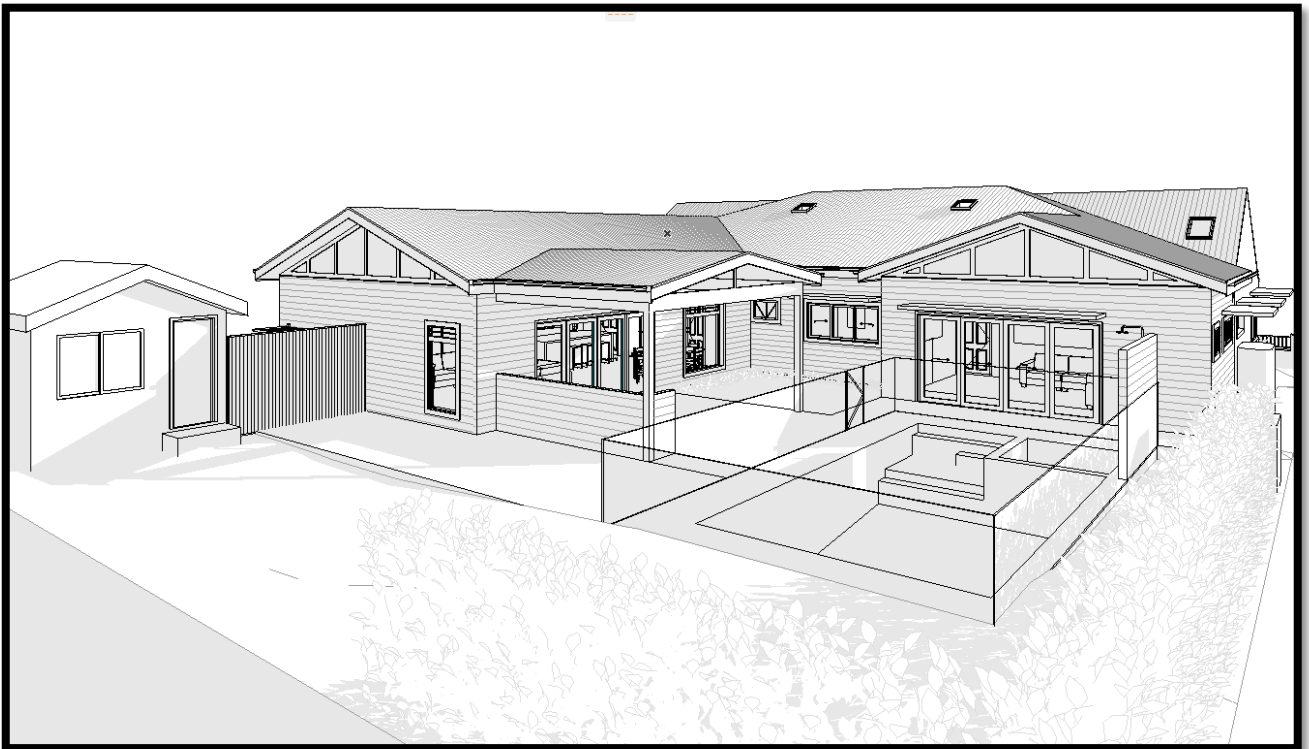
Proposed works at No. 27 Grace Avenue. (*Action Plans 2020*).
